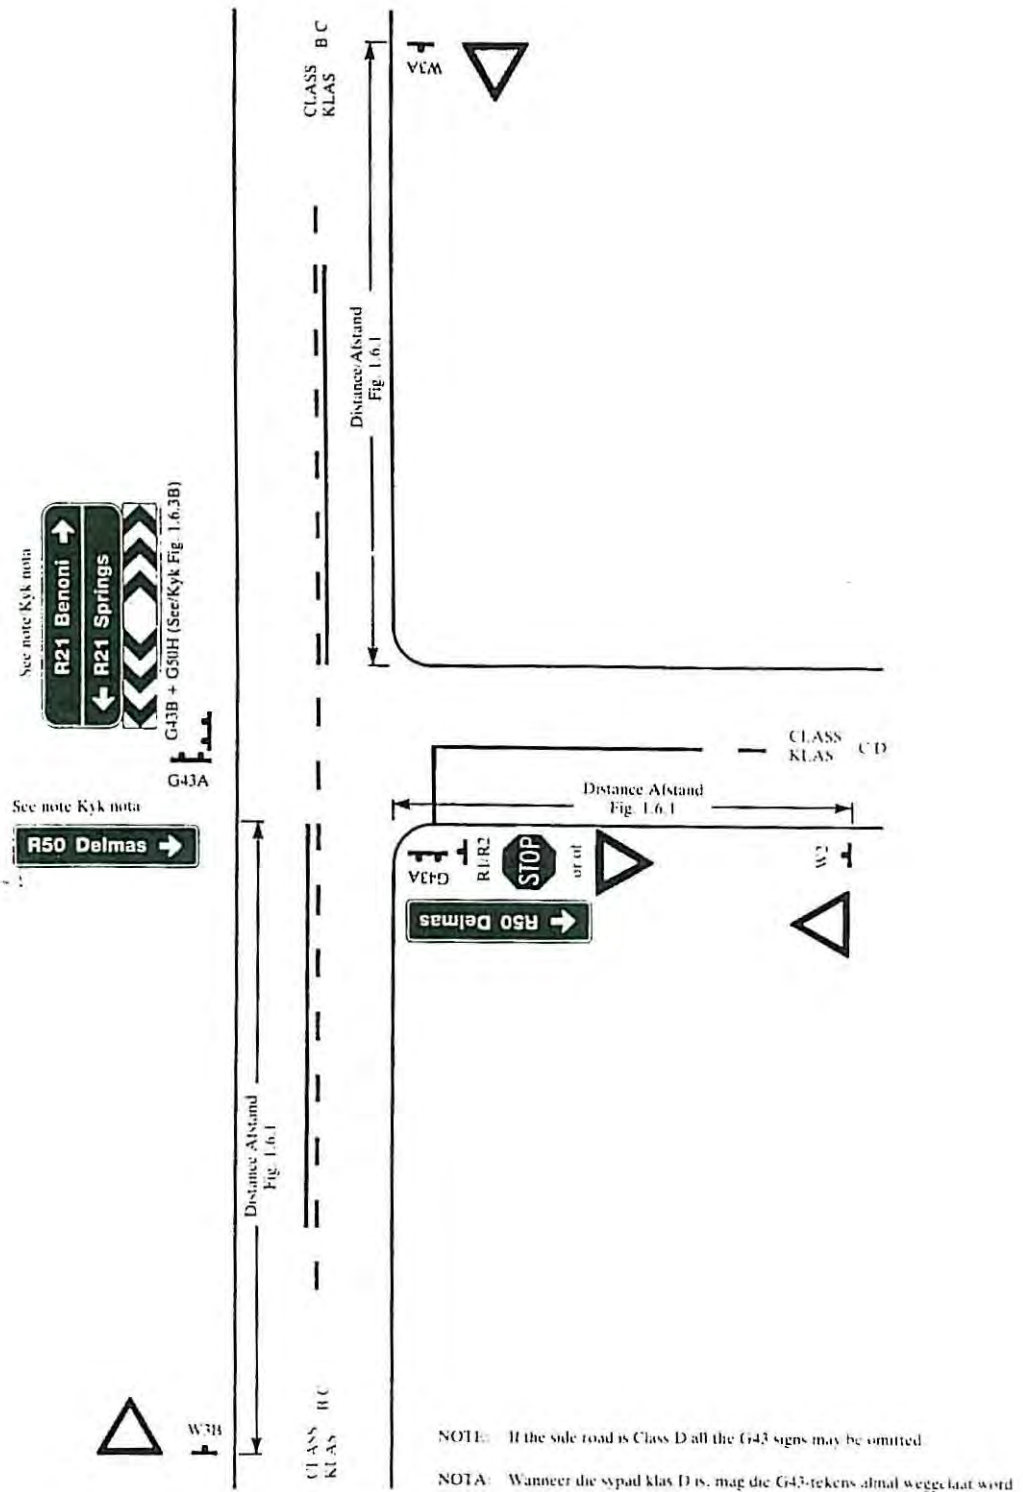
SIGN LAYOUT AT INTERSECTIONS
